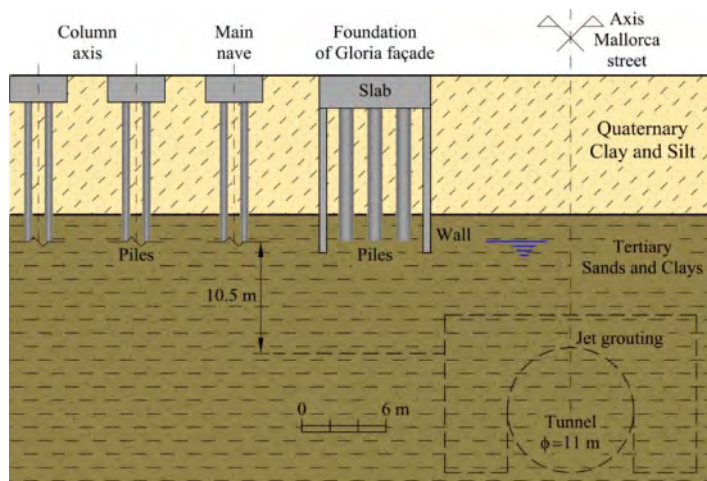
Pile foundations of the Glory façade and nave. Also indicated is a preliminary proposal to protect the church foundations by means of a jet grouting thick shield around the tunnel.
